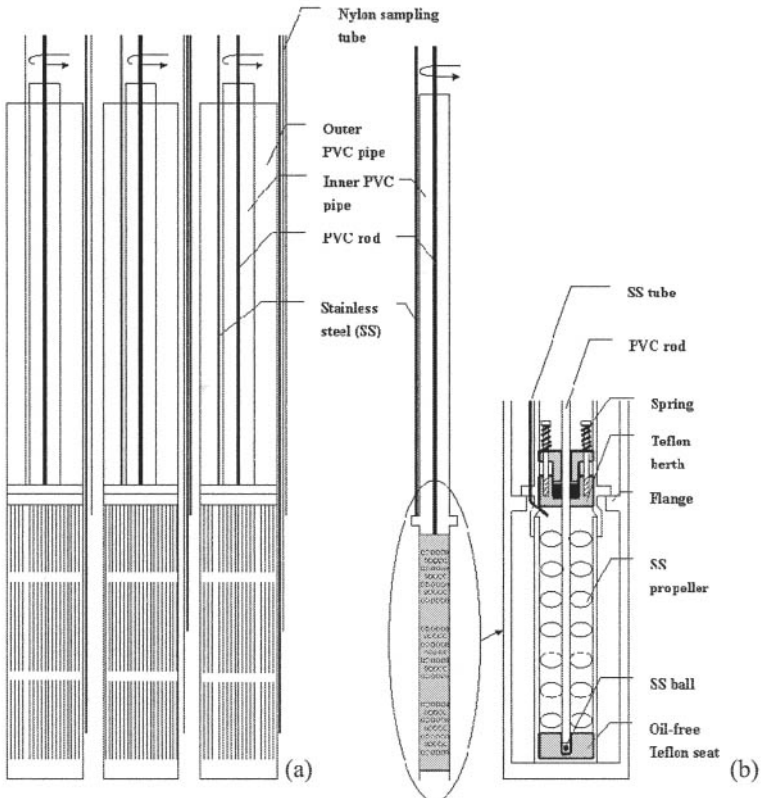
Design of the (a) injection wells and (b) inner PVC pipe installed at Vapokon site (adapted from Lai et al. 2006a)
